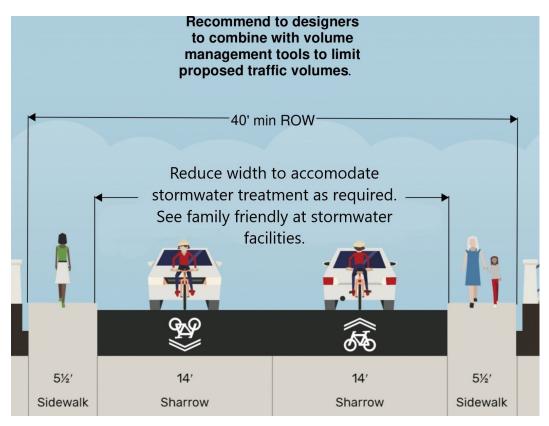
Family Friendly Street (Local Rural Street) Cross Section
